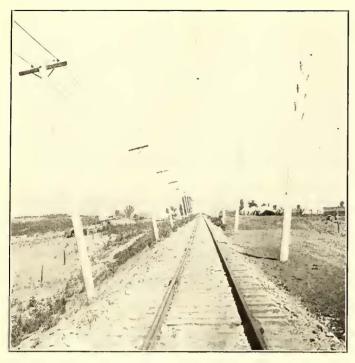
VIEW SHOWING TRACK AND OVERHEAD CONSTRUCTION
